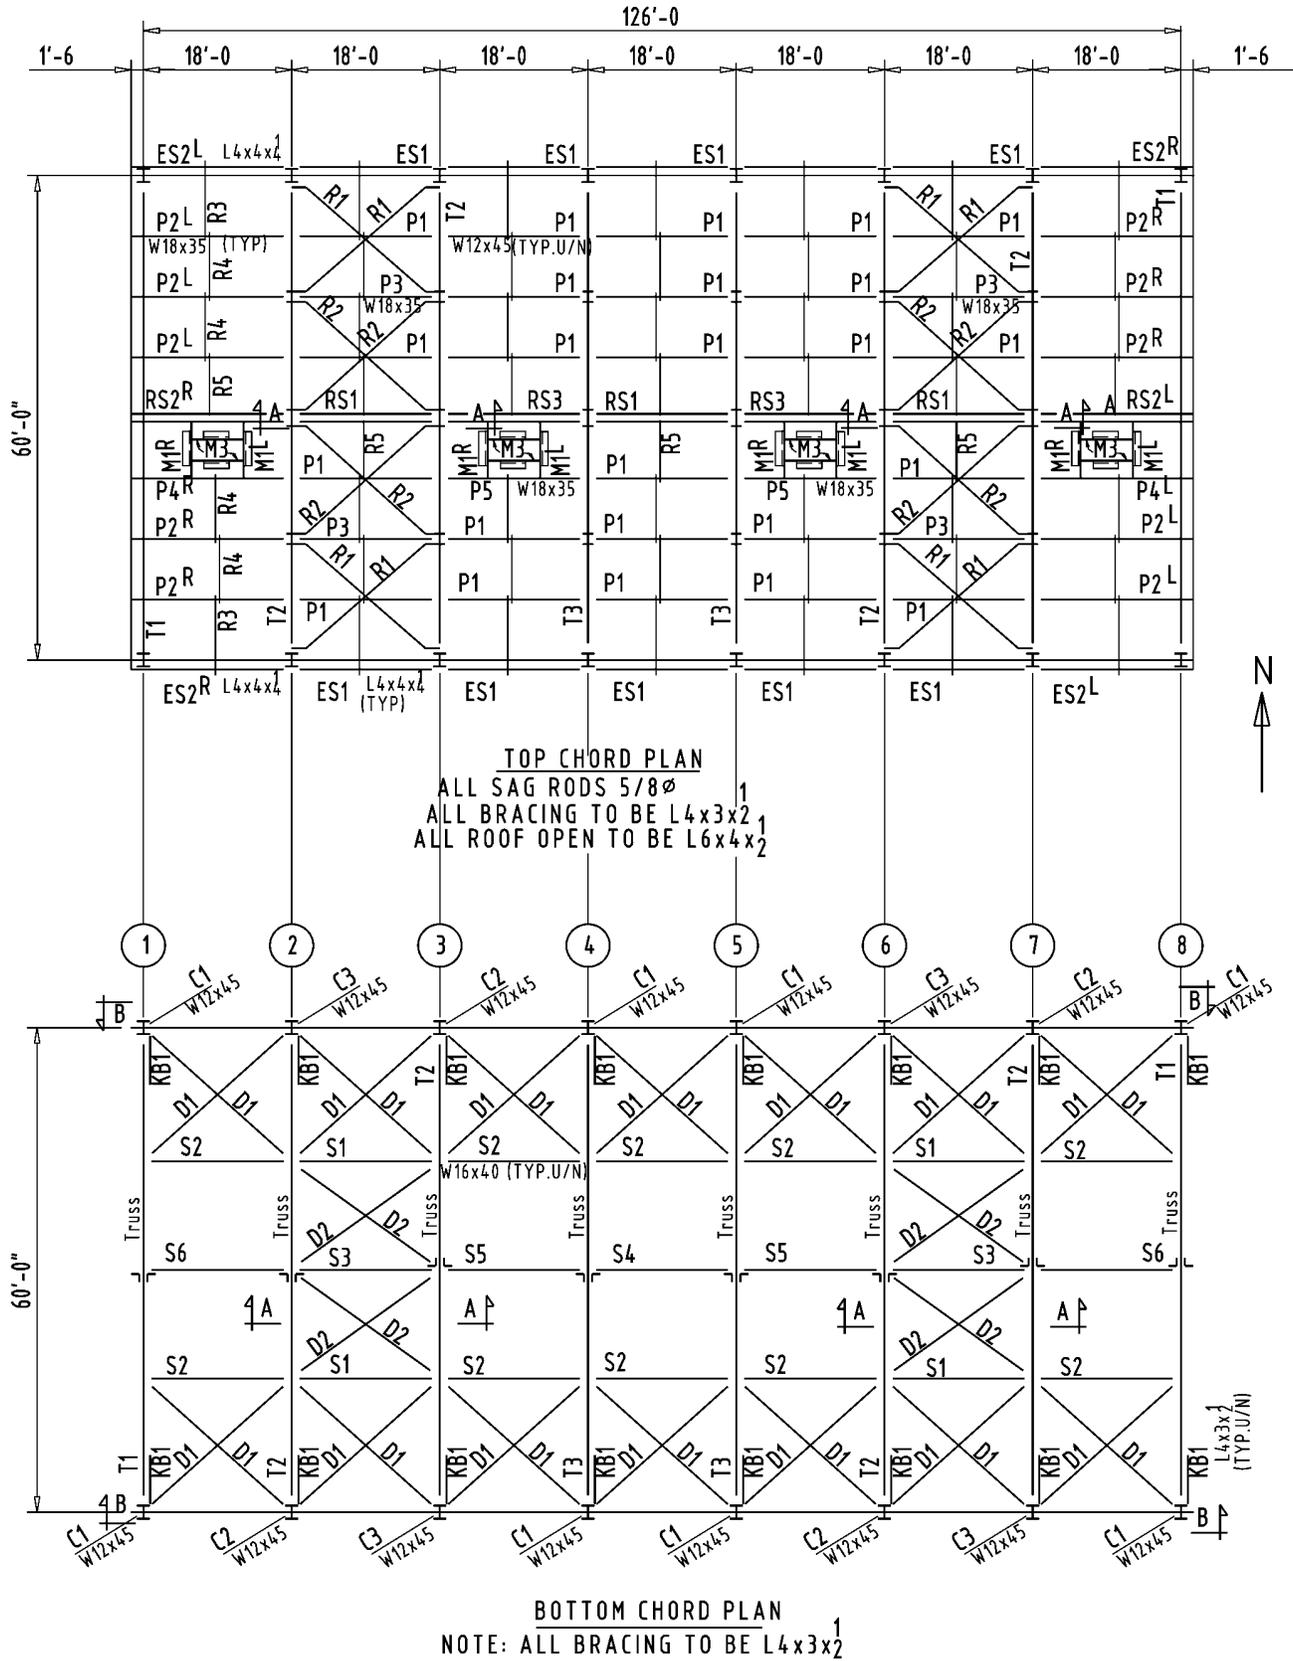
Erection drawings for the roof framing of an industrial building.
